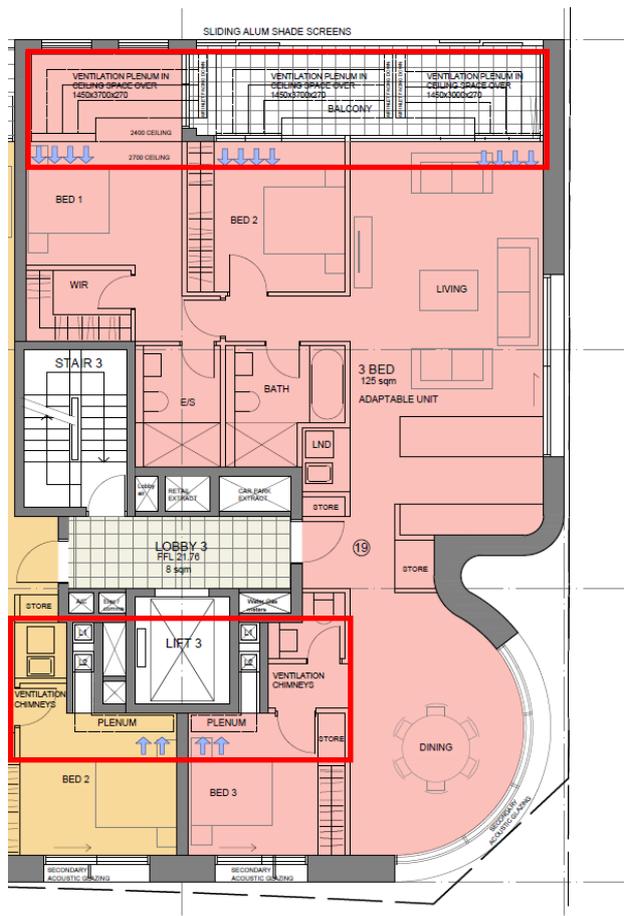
Plan extract from the 'Second Floor Plan' drawing by Carlisle Architects, indicating details of the proposed passive natural ventilation plenum and chimney system highlighted in red.
